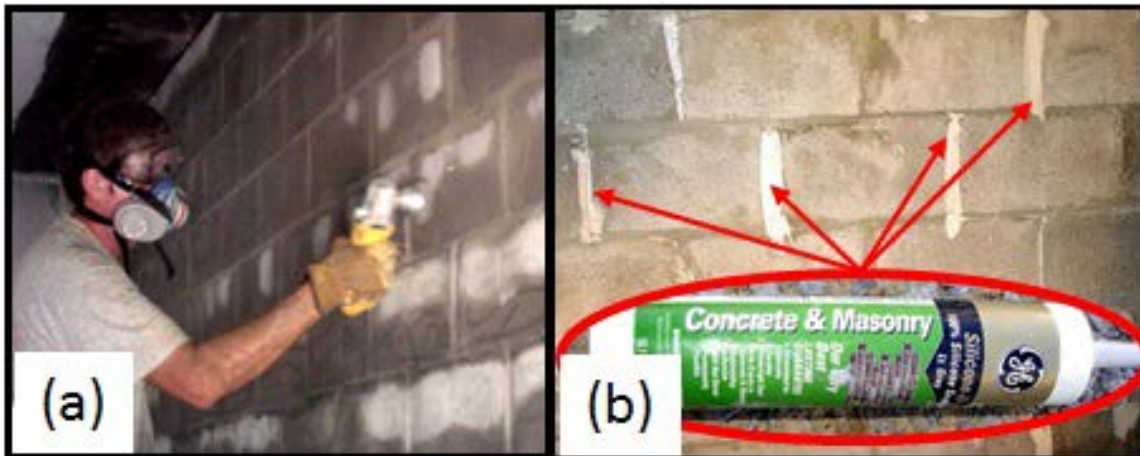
CMU wall preparation. (a) Wire brush used to remove excess mortar from face shells and joints. (b) Concrete and masonry silicone used to fill gaps in mortar joints.
